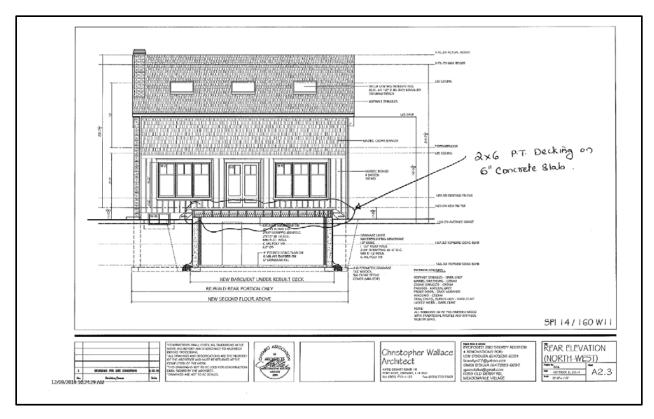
Rear view of backyard deck showing concrete deck clad with PT wood
